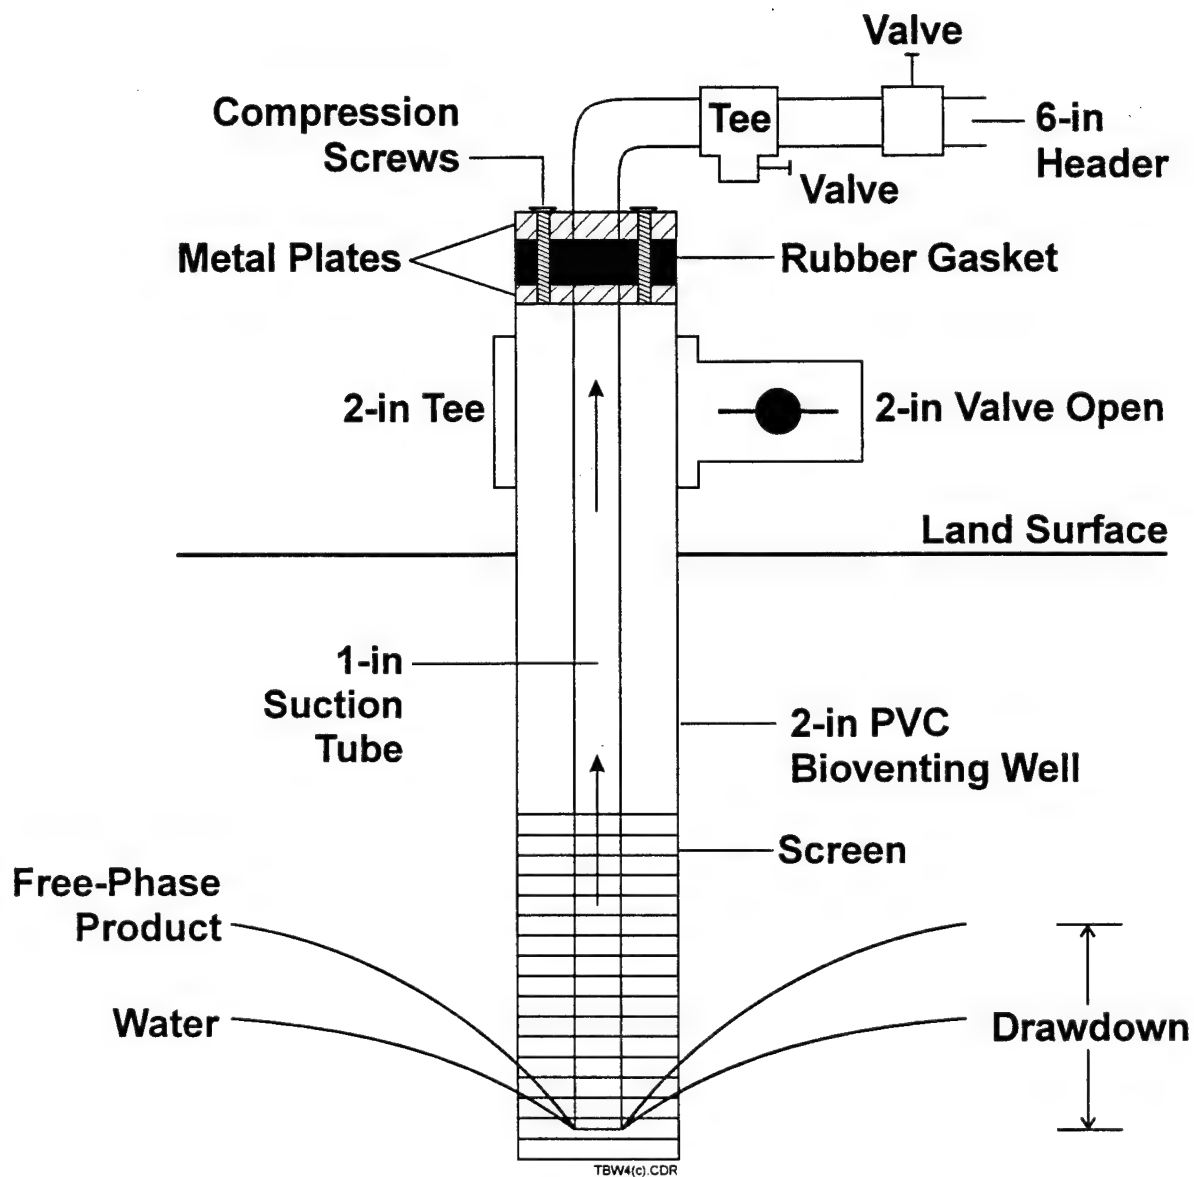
Slurper Tube Placement for the Drawdown Pump Test
